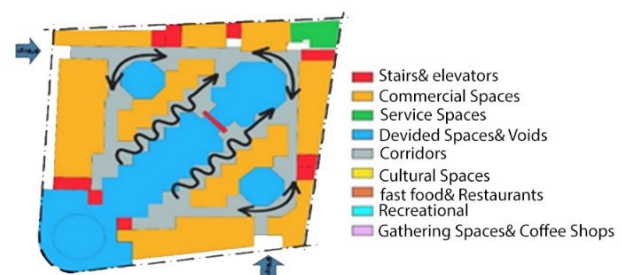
Schematic plan of the first floor of Tiraje. Authors.
